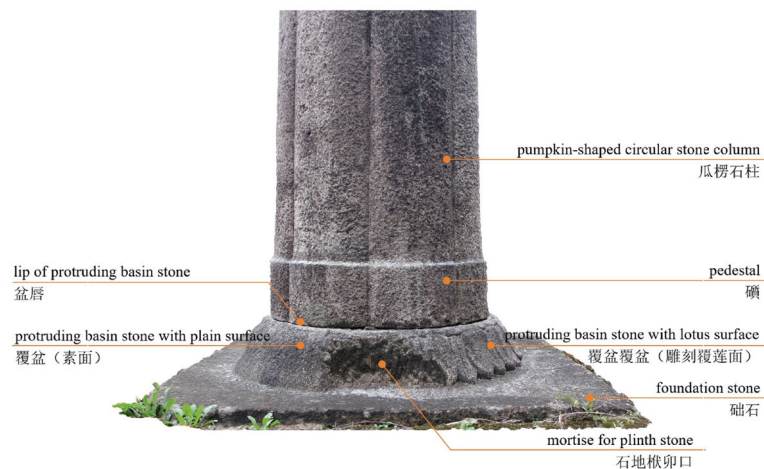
The base and foot of the remaining stone column (north elevation of W2). Drawing by authors.
